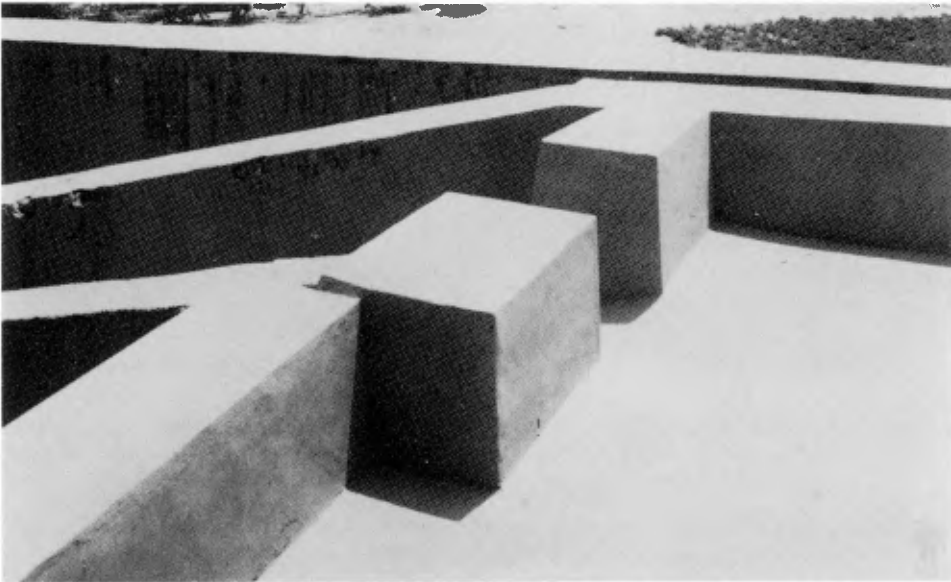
Huaca del Dragón, Trujillo (Peru). Capping of walls with mud mixed with polyvinyl acetate emulsion, resulting in perhaps too hard a surface and excessively smooth. Deterioration of original mudbrick takes place at junction of treated and untreated surfaces.
